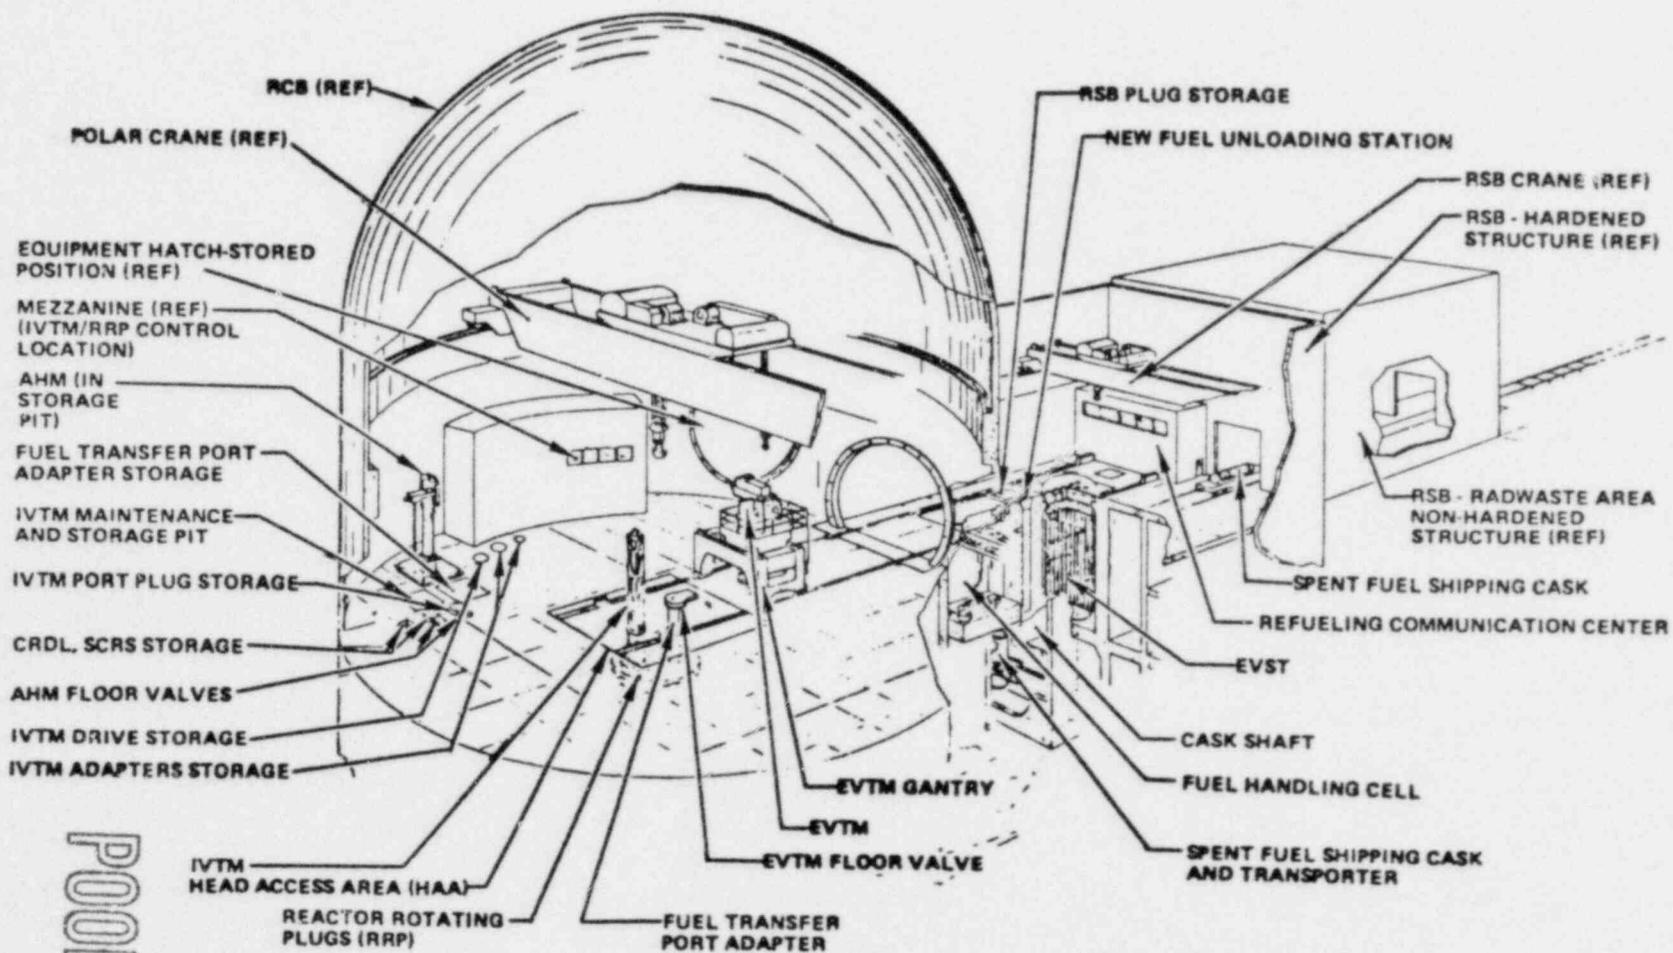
General Arrangement Plan of Fuel Storage/Handling Equipment and Facilities
